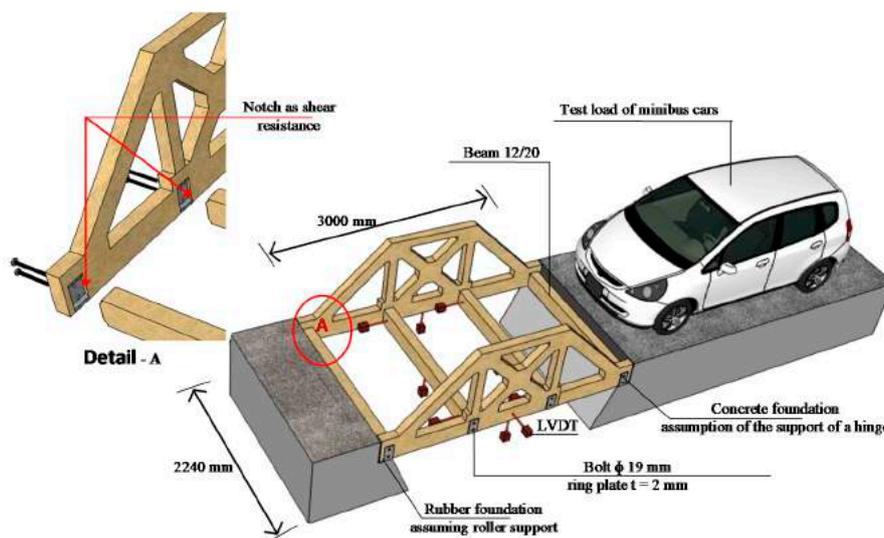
Arrangement of the testing of the bamboo reinforced concrete frame precast bridges.
